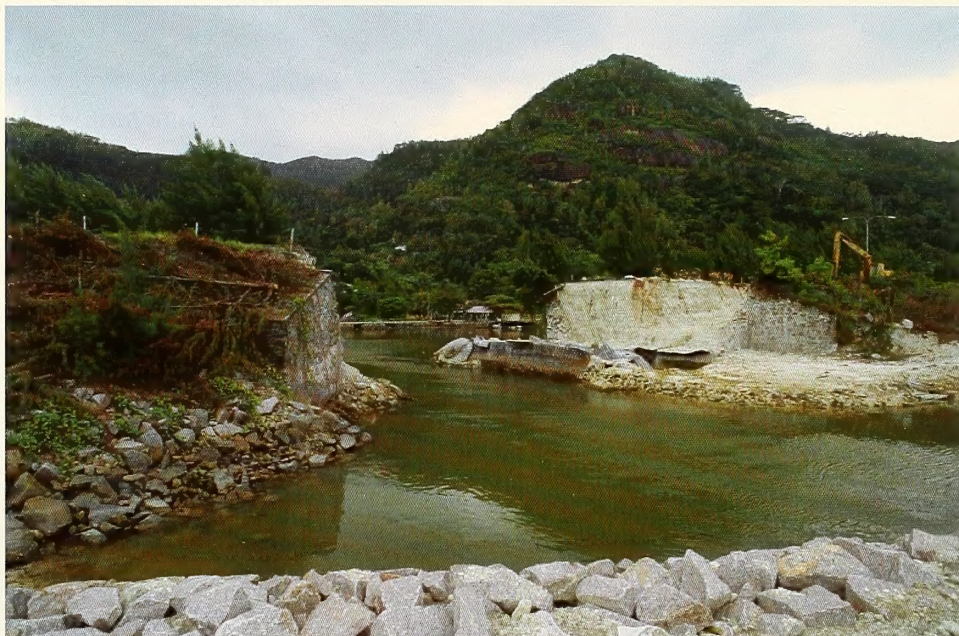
Road bridge washout from seaward drainage of tsunami waters from coastal lagoon, west coast of Mahé.
